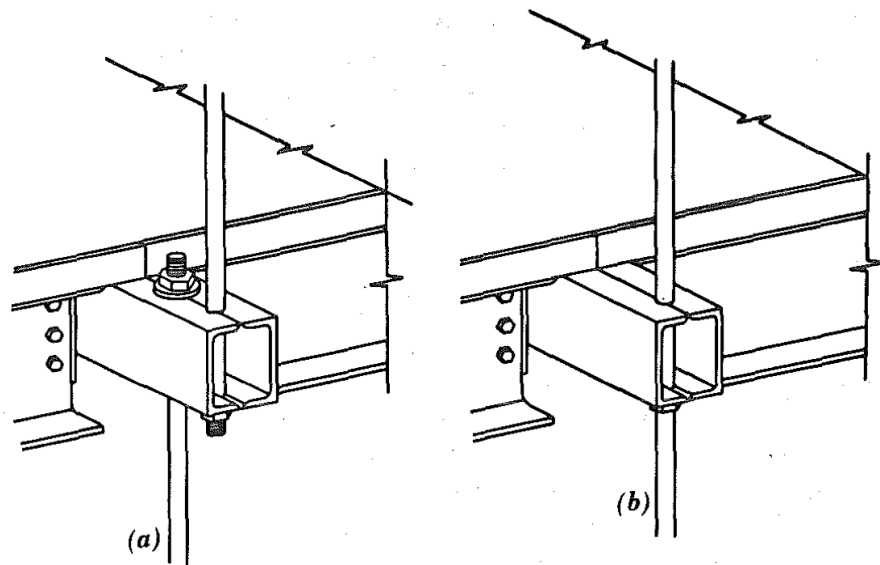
Fourth floor walkway box beam connection detail: (a) as-built; (b) original design
